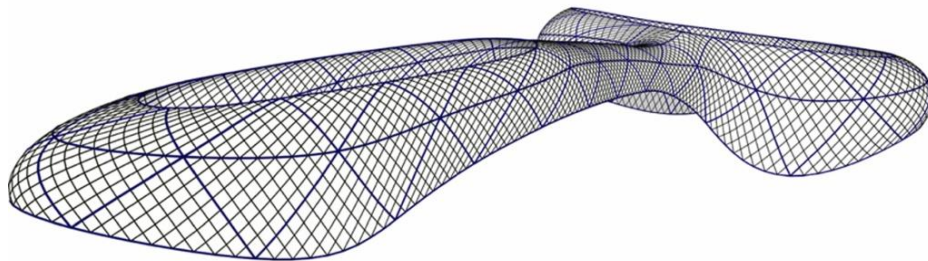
48. Triangular beam layout over the quadrangular grid structure, Yas Hotel, Abu Dhabi, Asymptote Architecture (Source: Pottmann, 2009)
